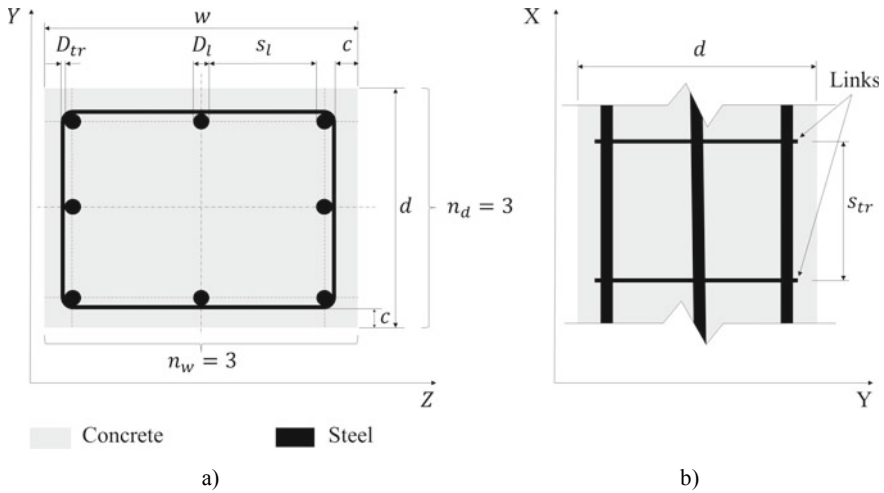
Geometric parameters of the rectangular RC column: a cross section; b longitudinal section
